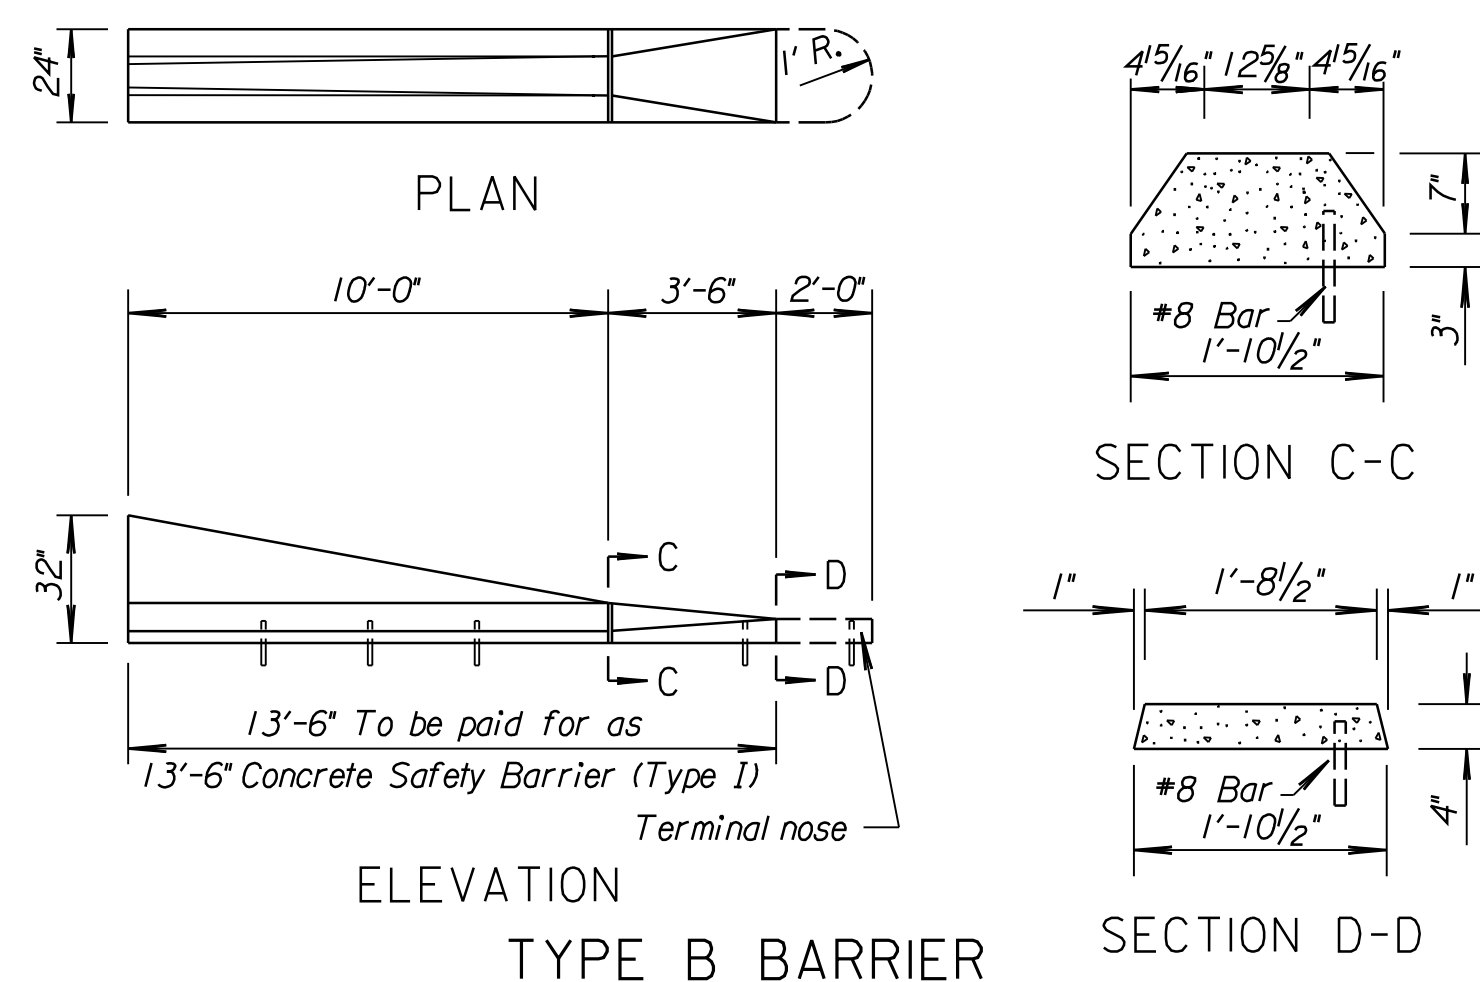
DETAIL FOR BRIDGE WITHOUT SAFETY TYPE RAIL
